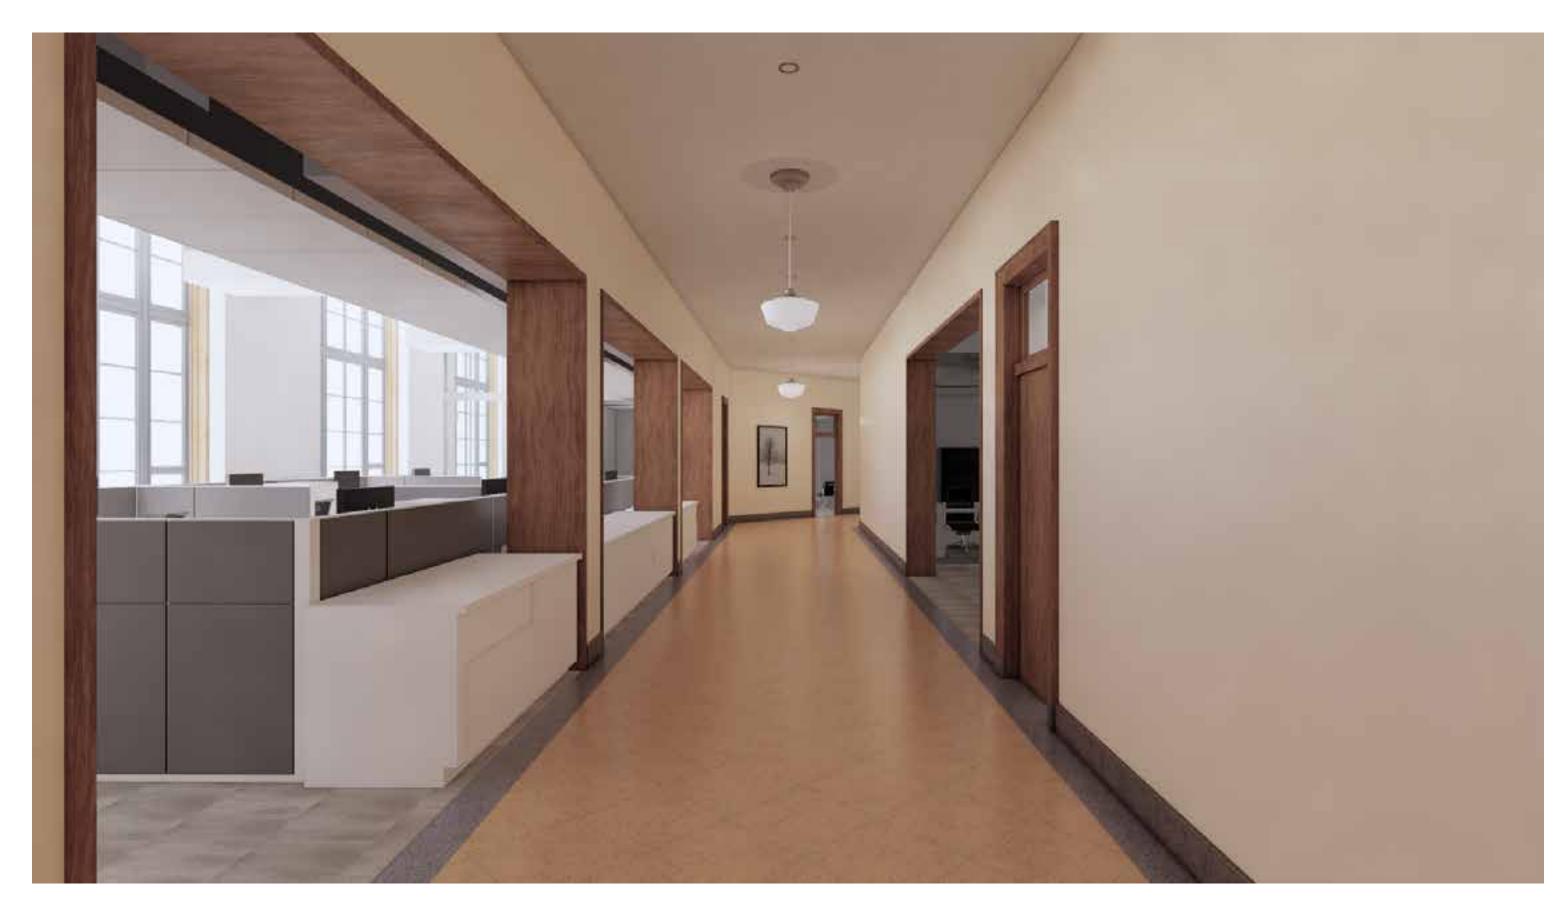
Perspective View of FRB-East Building Historic Corridor
